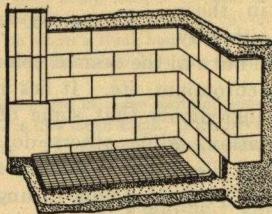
Illustrating tile door trim and plinth, with cove on floor. Combination tile is most desirable to be used with wood construction.
